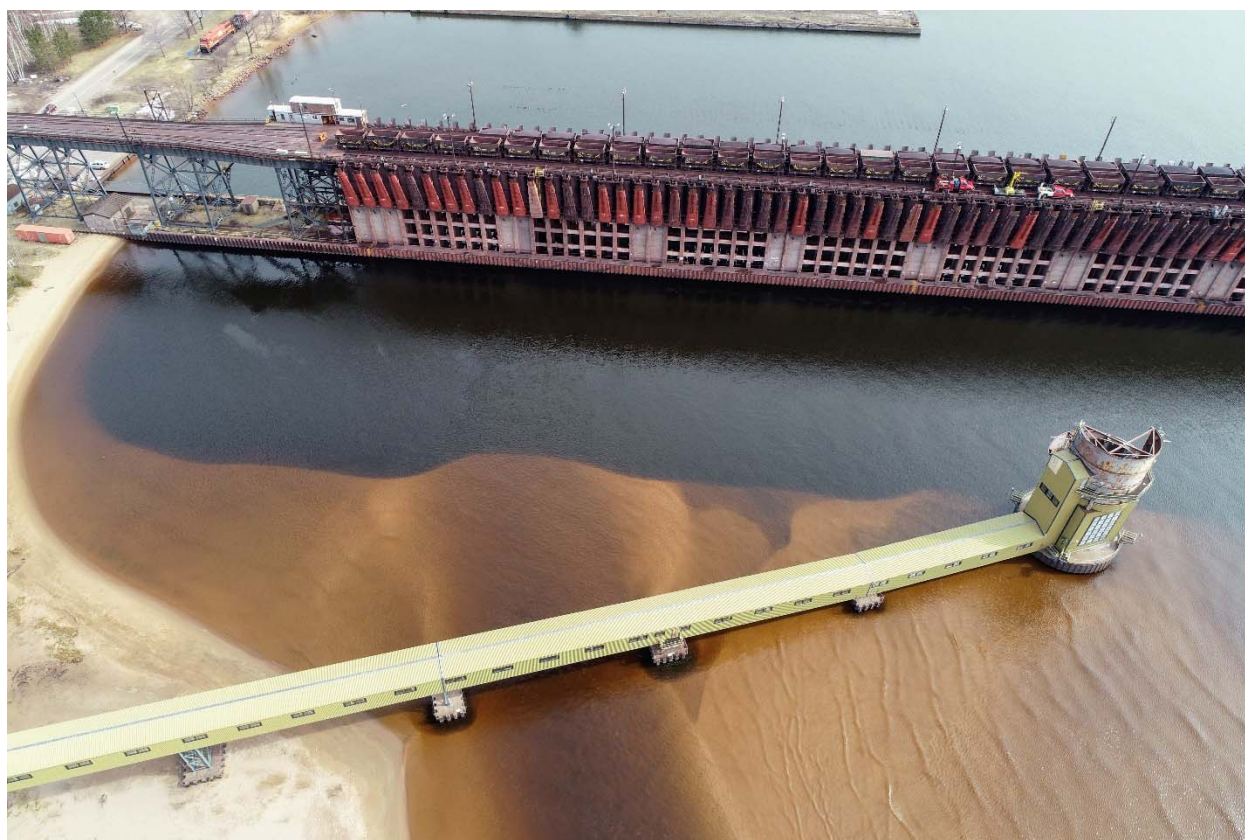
Aerial photo of the sediment plume encroaching on the Marquette Ore Dock slip.
